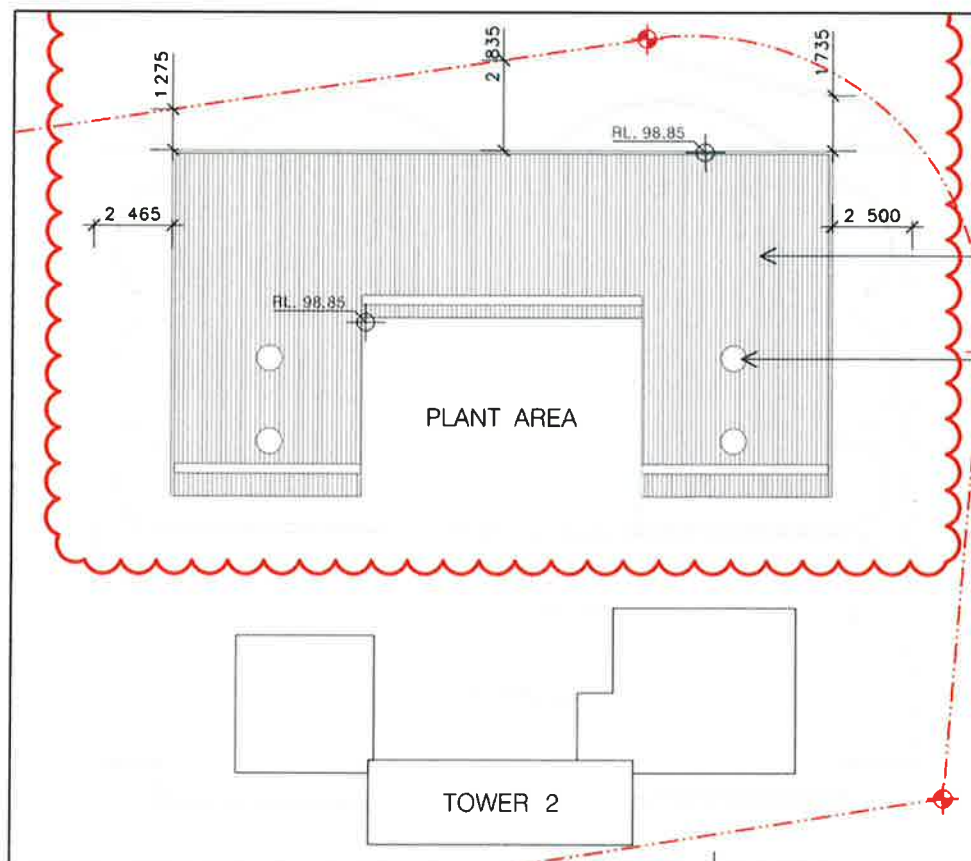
Proposed roof plan (Source: Amended MOD 5 architectural plans)
